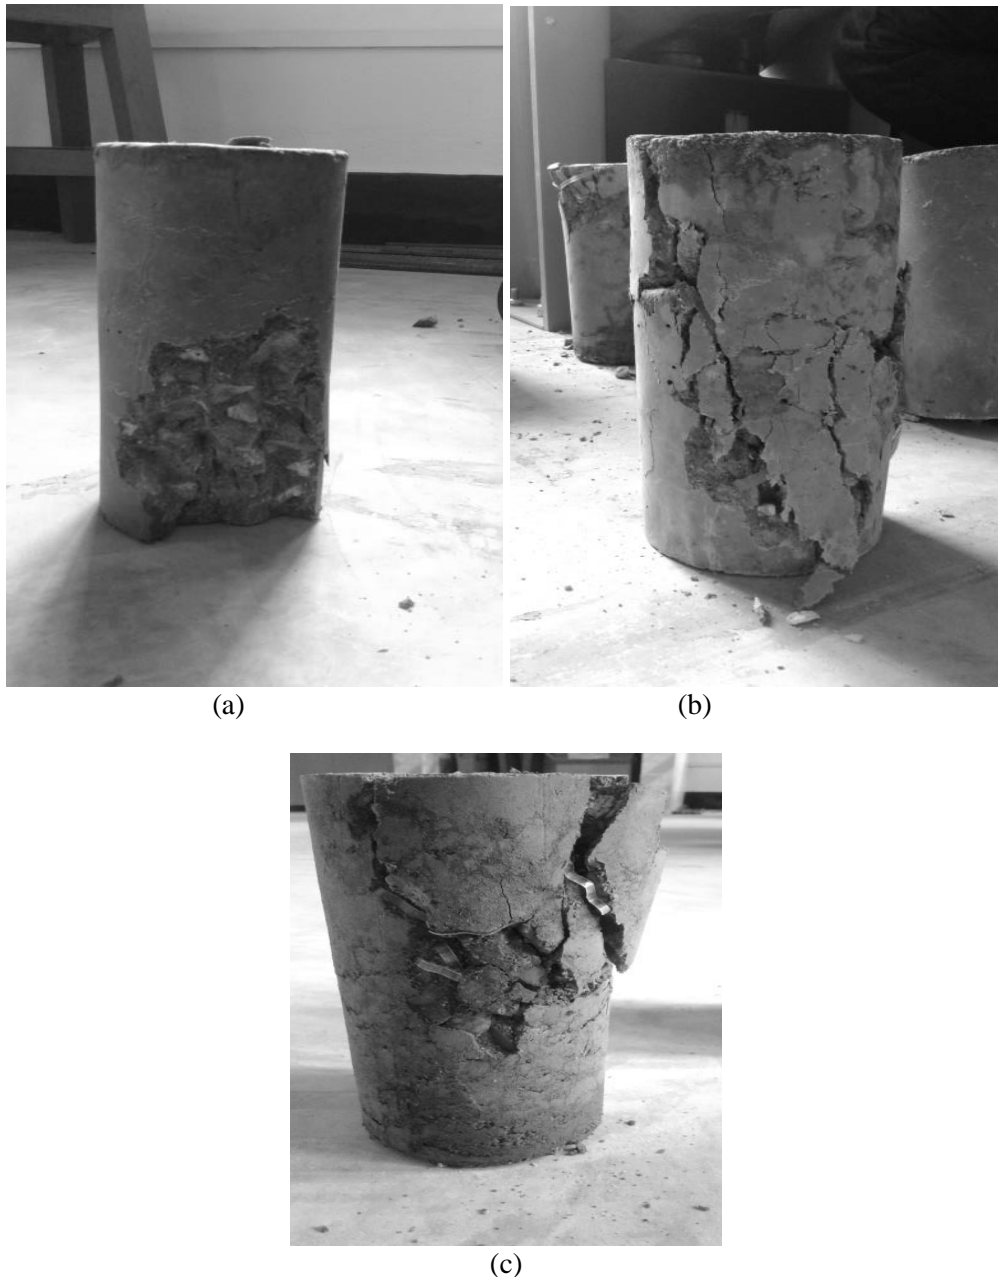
(a) Plain concrete (b) Concrete with straight fibers (c) Concrete with zigzag fibers
